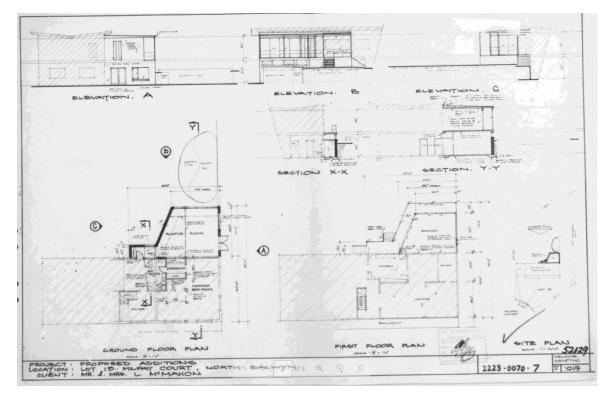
Working drawing of rear extension undertaken in 1972 adding a rumpus room and dining room. (Source: BP 52129)
